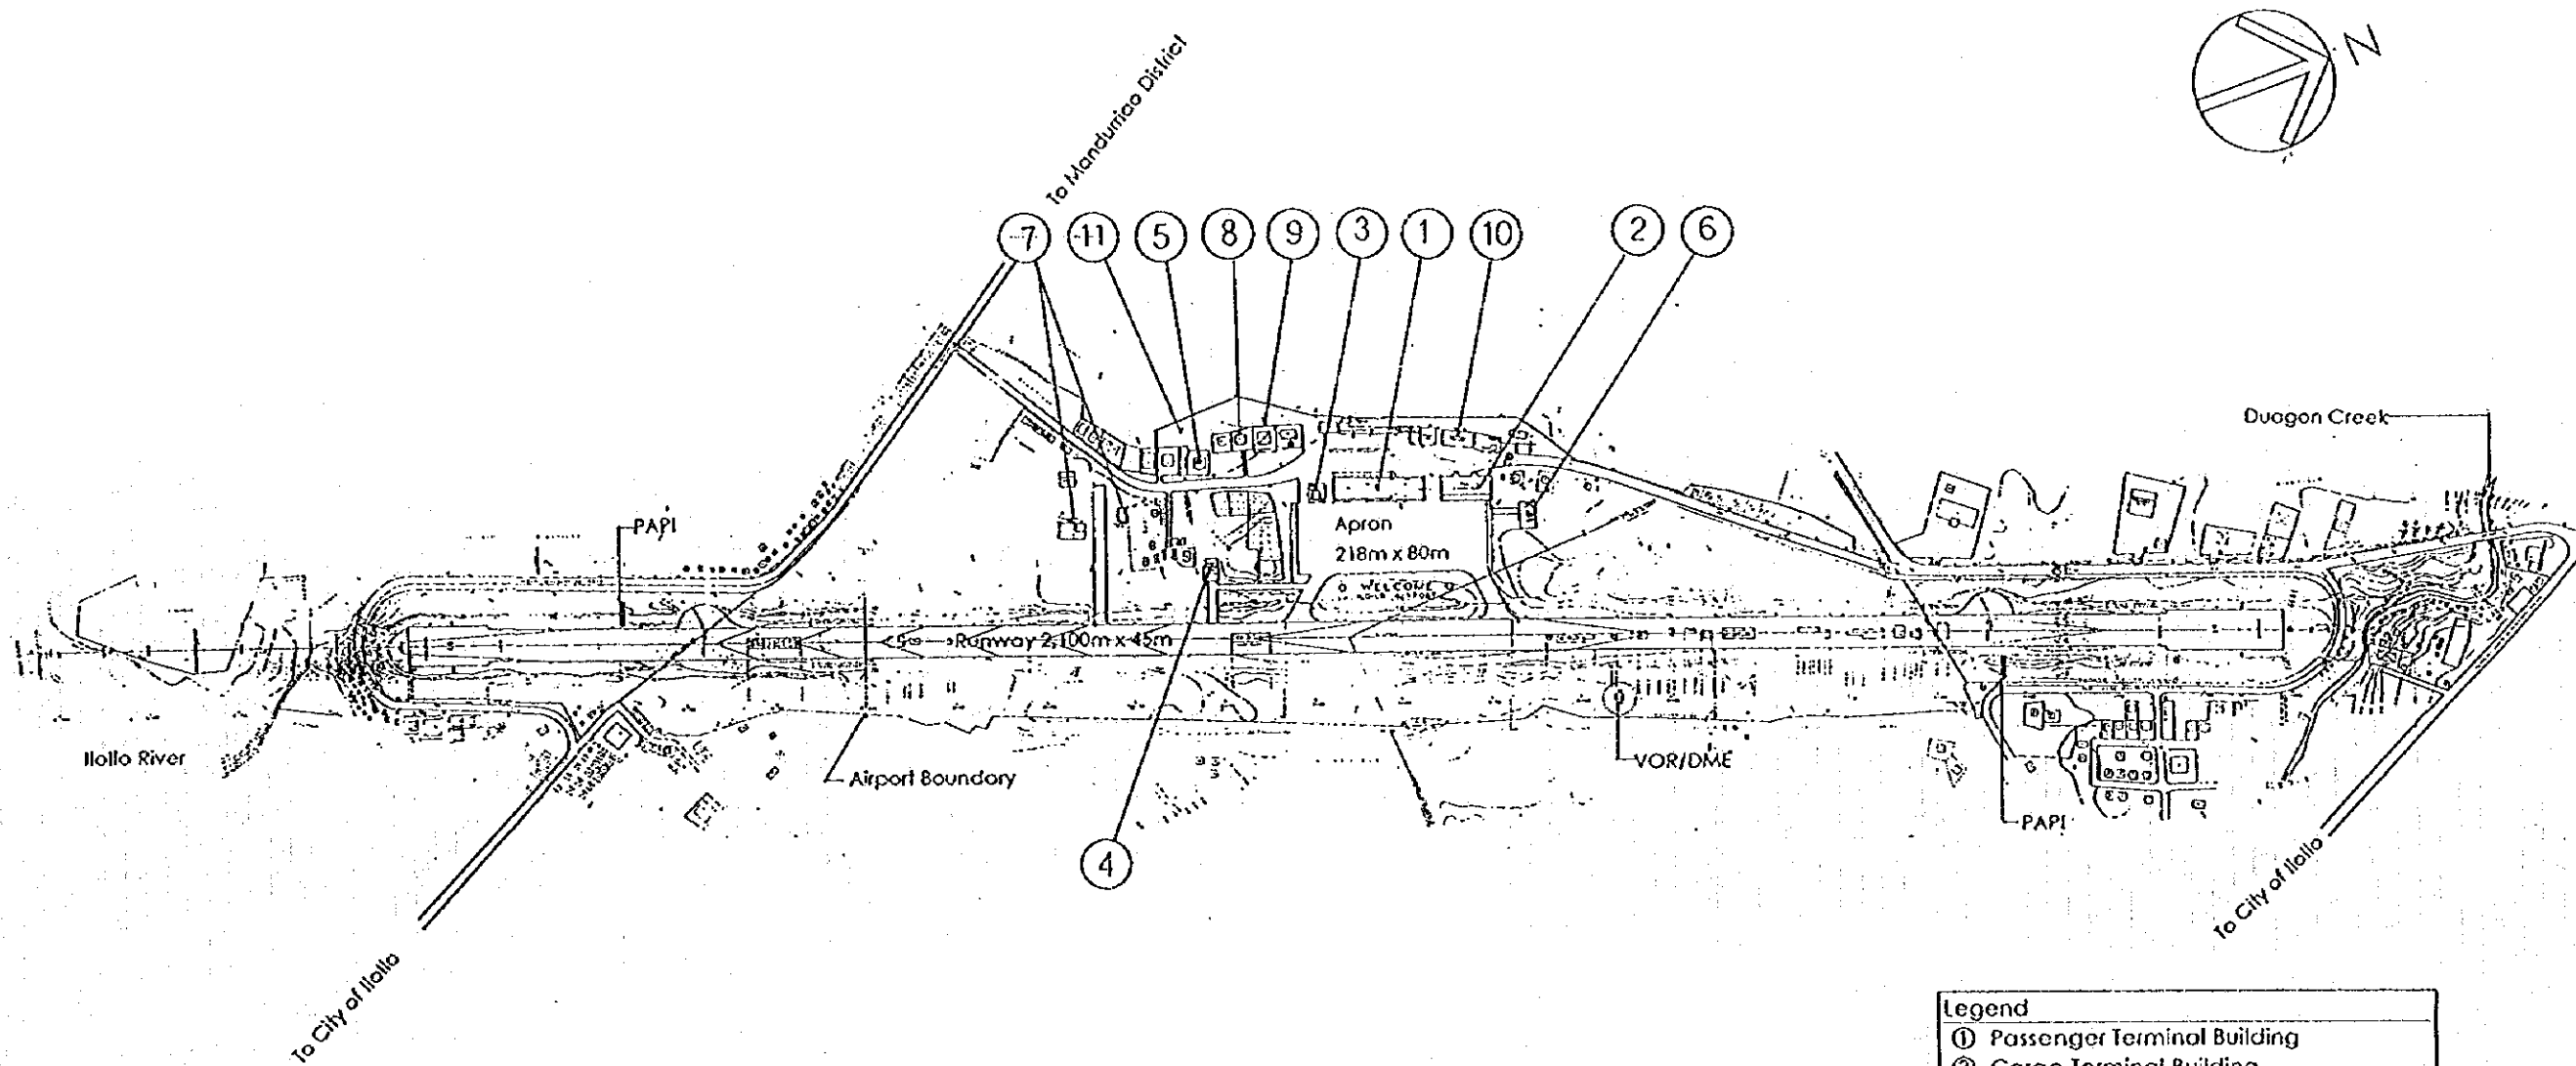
Existing Layout of Facilities at Iloilo Airport
